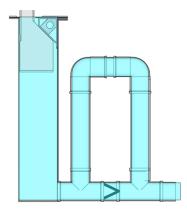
Floodwater rises through storm sewers into the pipe conection
